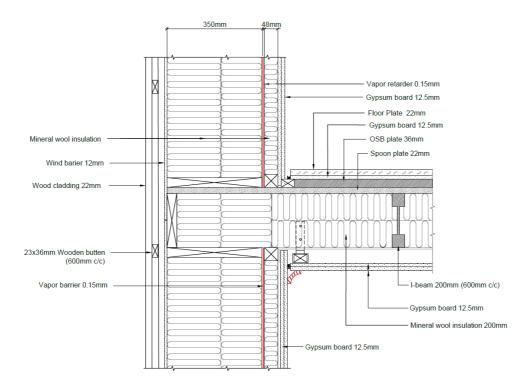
timber wall and floor detail (Byggforsk TEK17)
